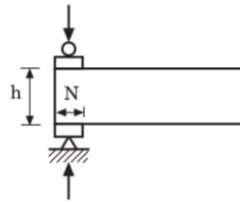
End Two-Flange Loading (ETF) in AISI S909-17
